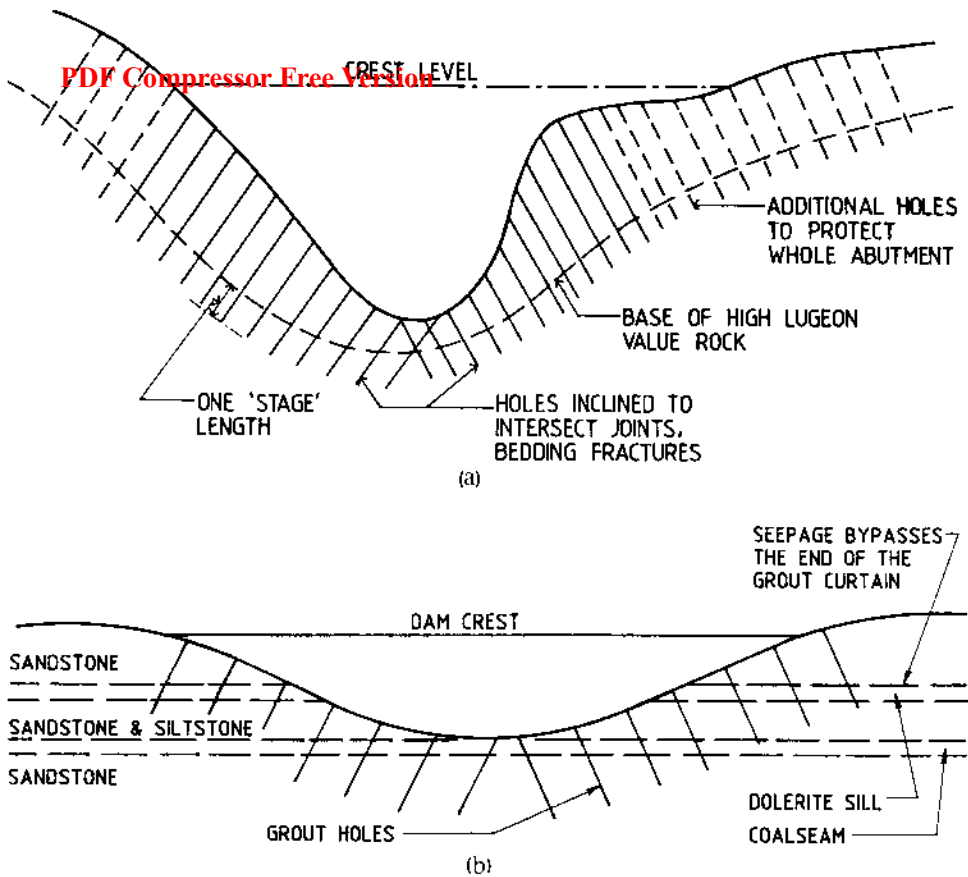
a) Example of grout curtain extended beyond dam crest. b) Example where seepage bypassed the end of the grout curtain.
